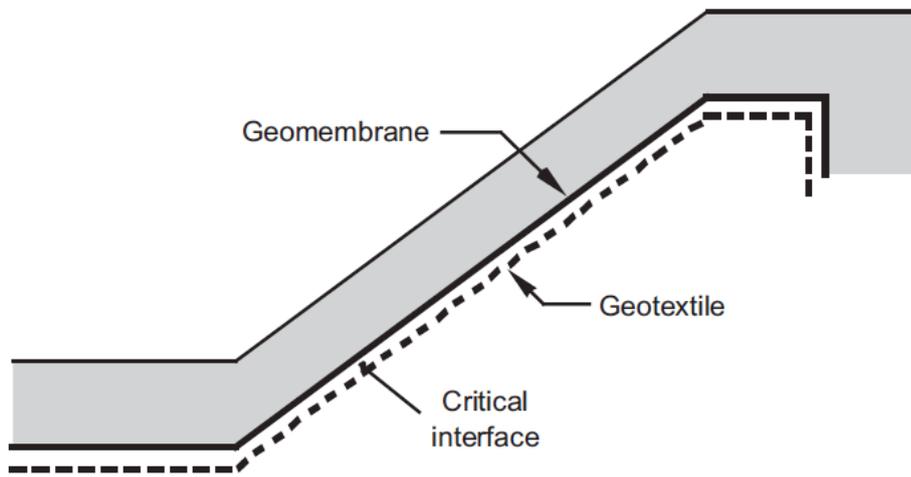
Veneer reinforcement with geomembrane on geotextile (Koerner and Soong, 2005)
